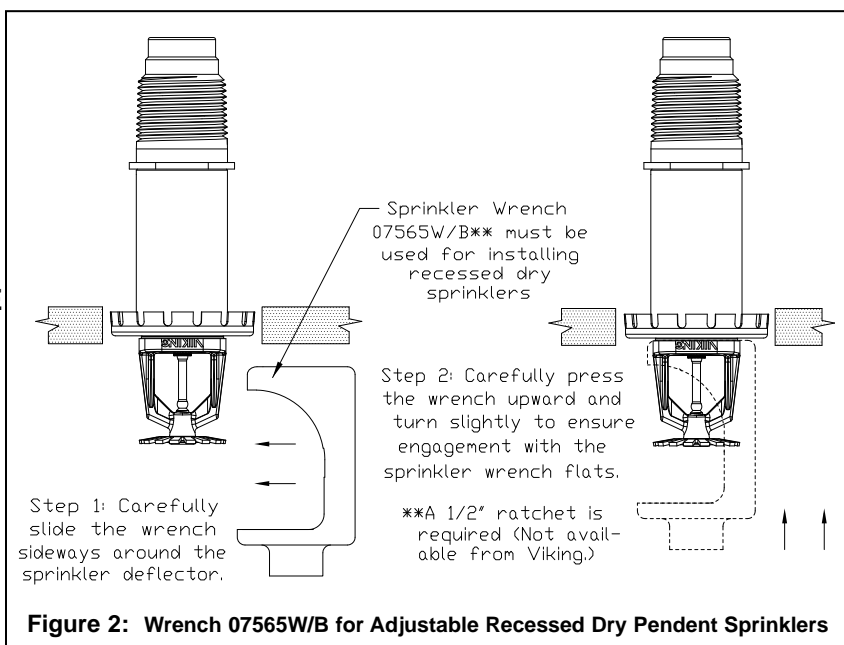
Wrench 07565W/B for Adjustable Recessed Dry Pendent Sprinklers
